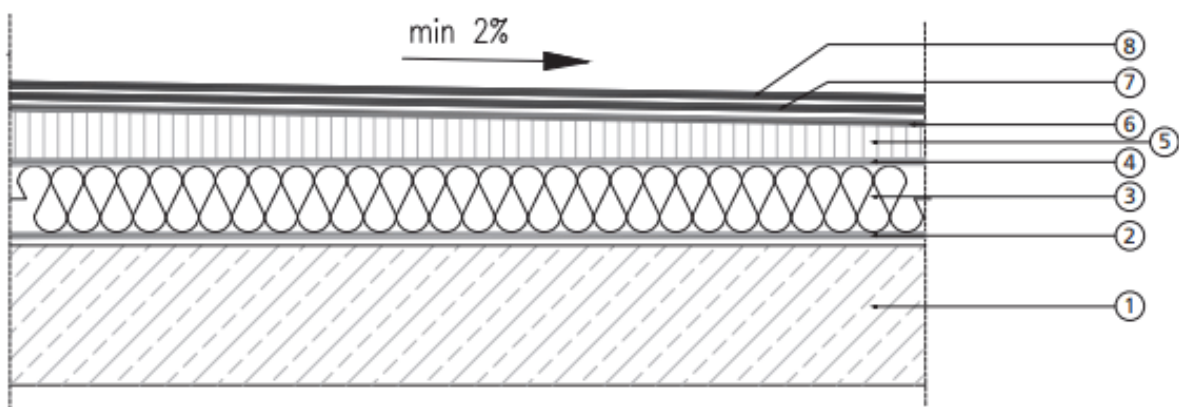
Detail of a brand-new waterproofing and thermal insulation application to a single (warm) flat roof
